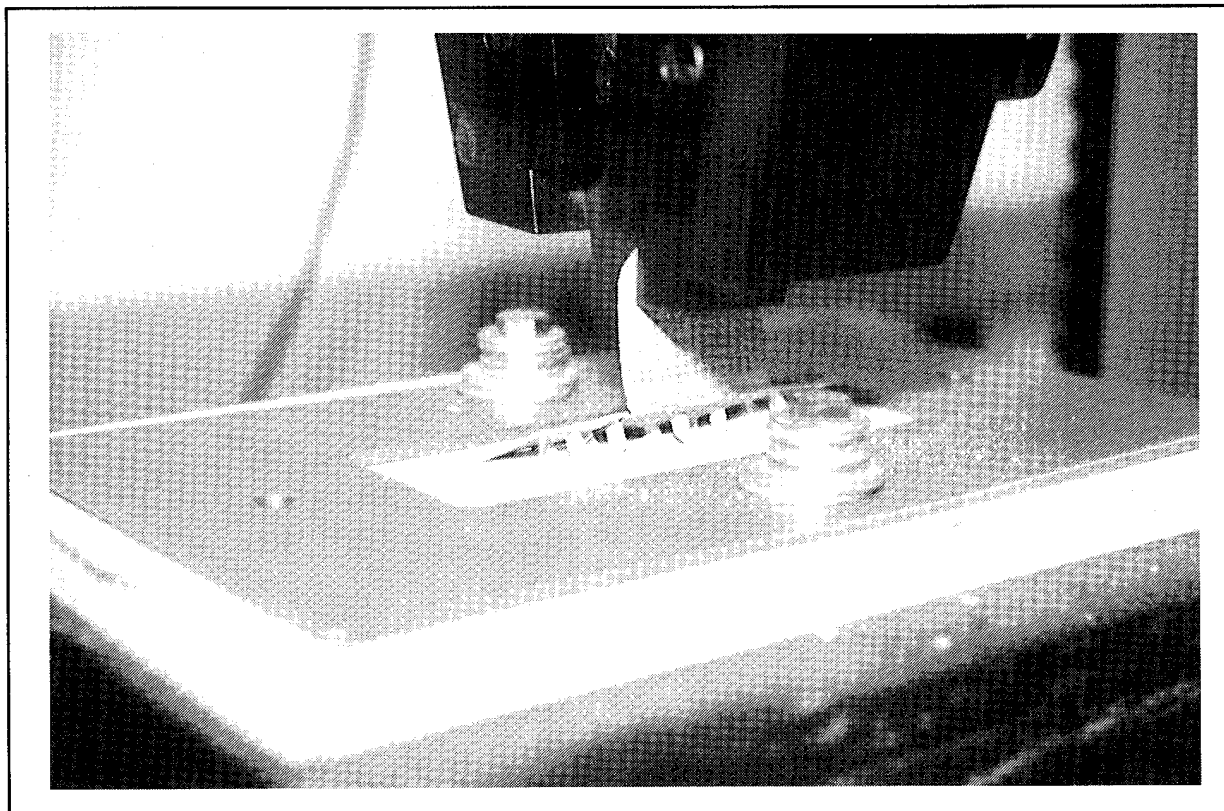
Typical failure of pronged plate as it is pulled out of gypsum drywall.
